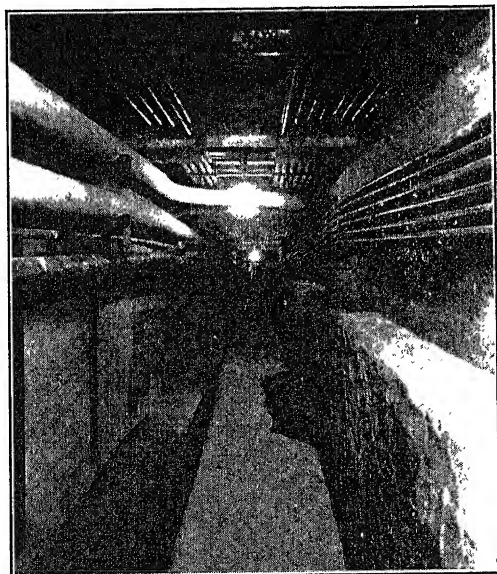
VIEW OF CABLE TUNNEL LOOKING SOUTH
